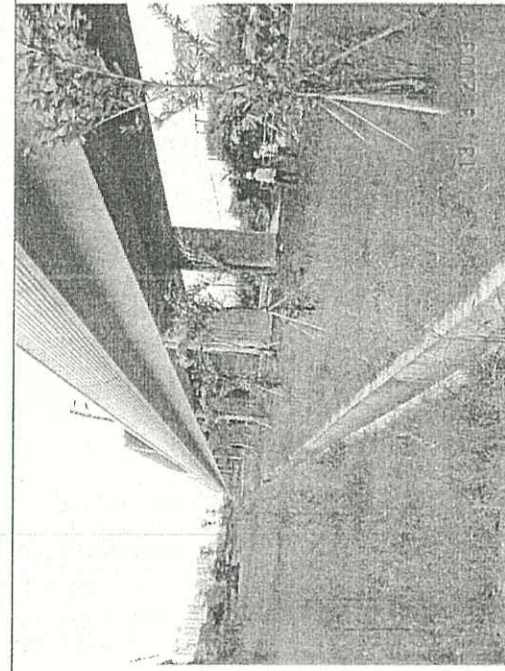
Landscape Planting at Yick Yuen (Piers 22-28)
